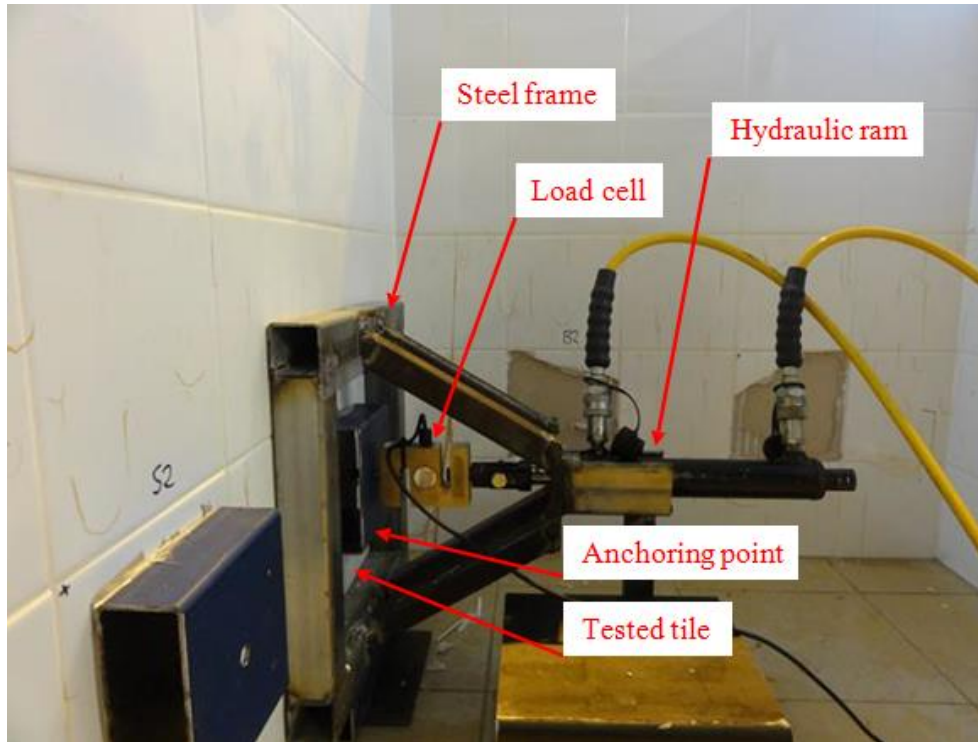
WALL TILE HYDRAULIC TEST SET UP
